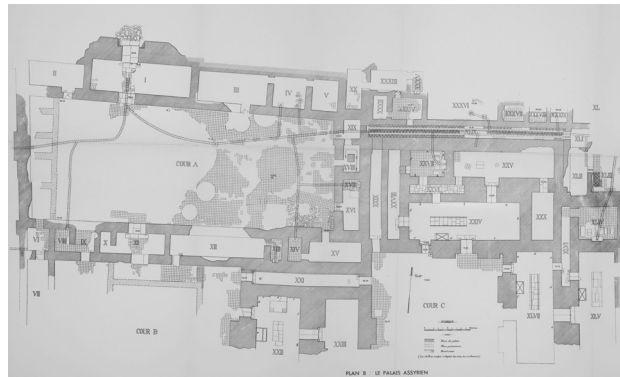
Floorplan of the Til-Barsip Palace (Thureau-Dangin, Dunand 1936, plan B)
